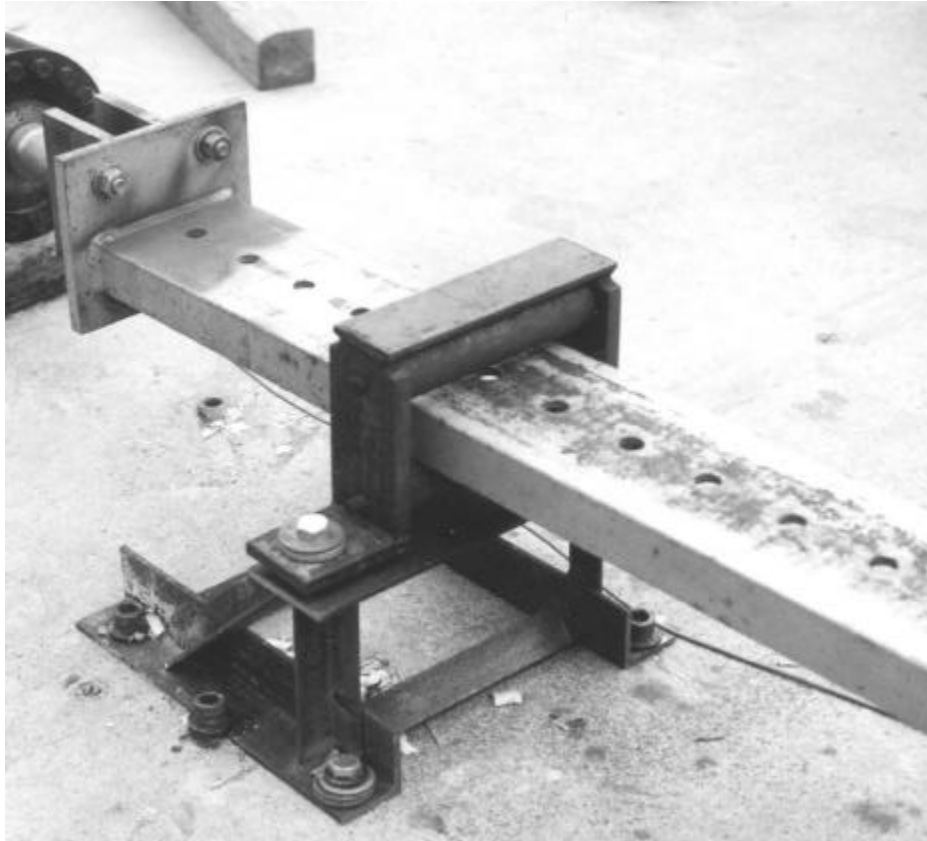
Rollers and frame bolted to concrete utilized to restrain steel channel attached to center rafter from lifting off of the concrete test bed during testing.
